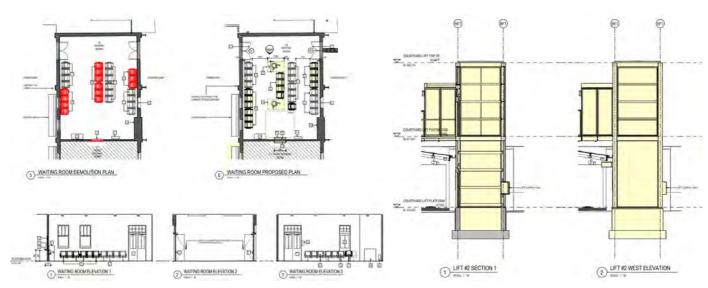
Waiting room details (Architectus, drawings dated 19/1/2024)
